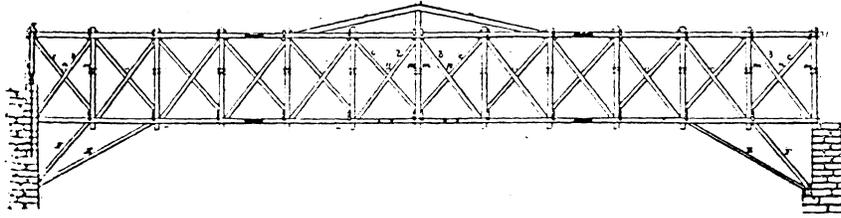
Stephen H. Long's panel truss timber bridge patented in 1830. (From American Building, Carl Condit, illus. 16.)
